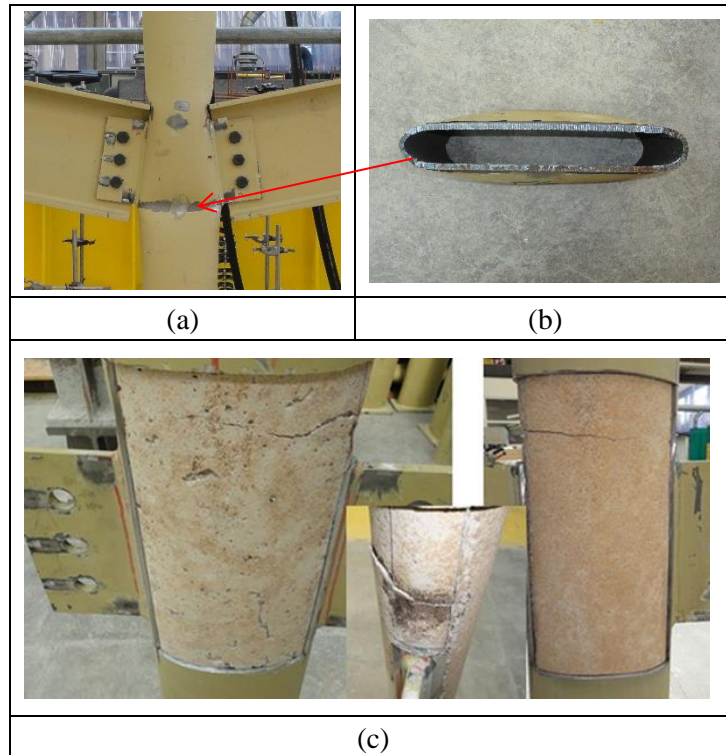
Failure of Type-B connections: (a) Joint-B; (b) Bottom cross-section of Joint-B column; (c) Core concrete of Joint-BC
